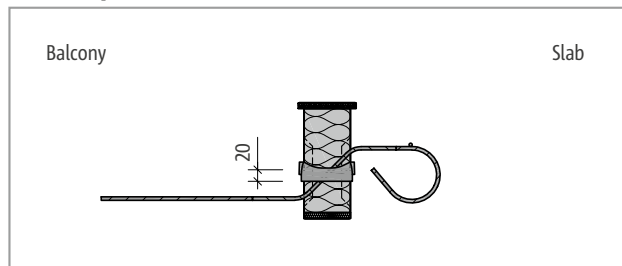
Schöck Isokorb® T type Q-V1 to Q-V5: Cross section of the product
